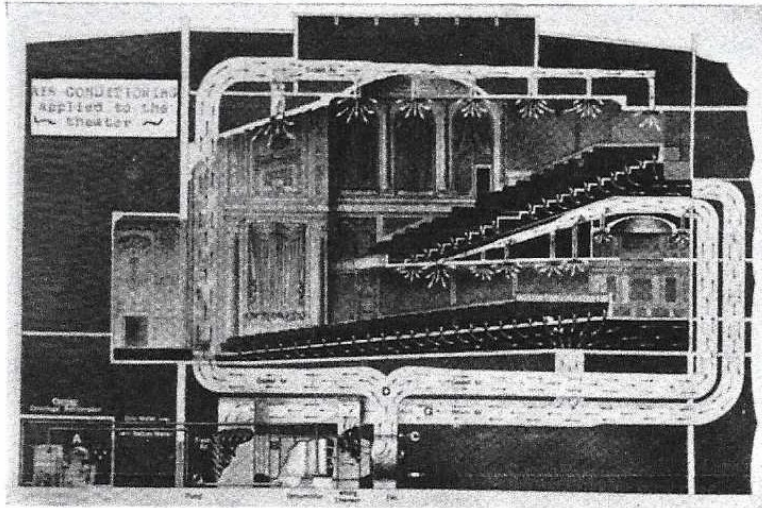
SECTIONAL VIEW OF THE THEATRE SHOWING AIR CONDITIONING EQUIPMENT AND AIR CIRCULATION
